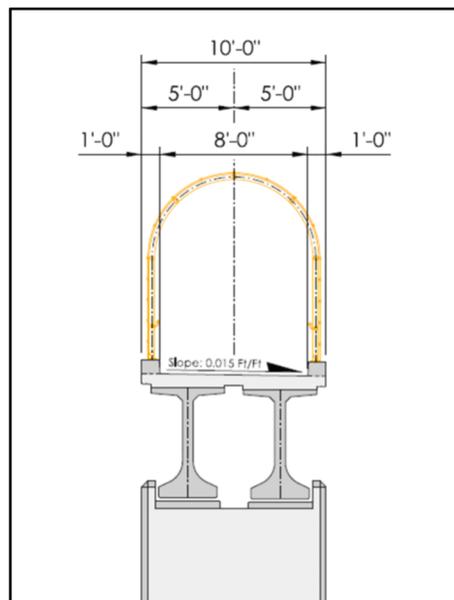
Pedestrian Overpass, North of Bird Road, Typical Section
